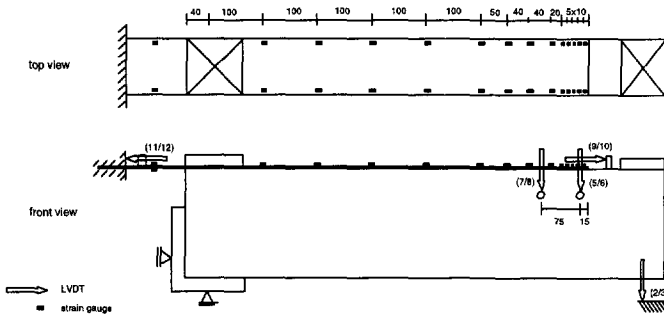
Location of strain gauges for test series A-L, top view and front view
